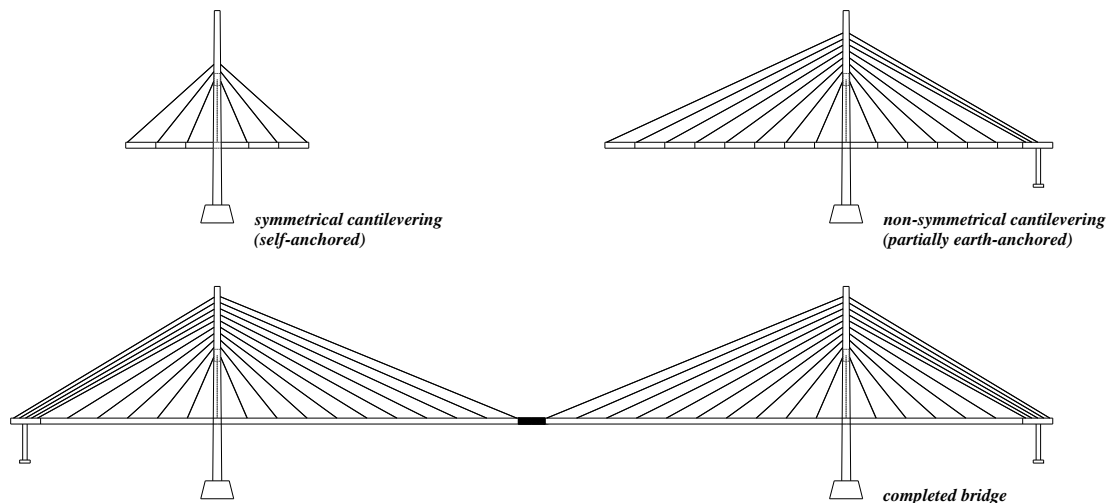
Construction sequence by cantilevering and final configuration with the central joint..
